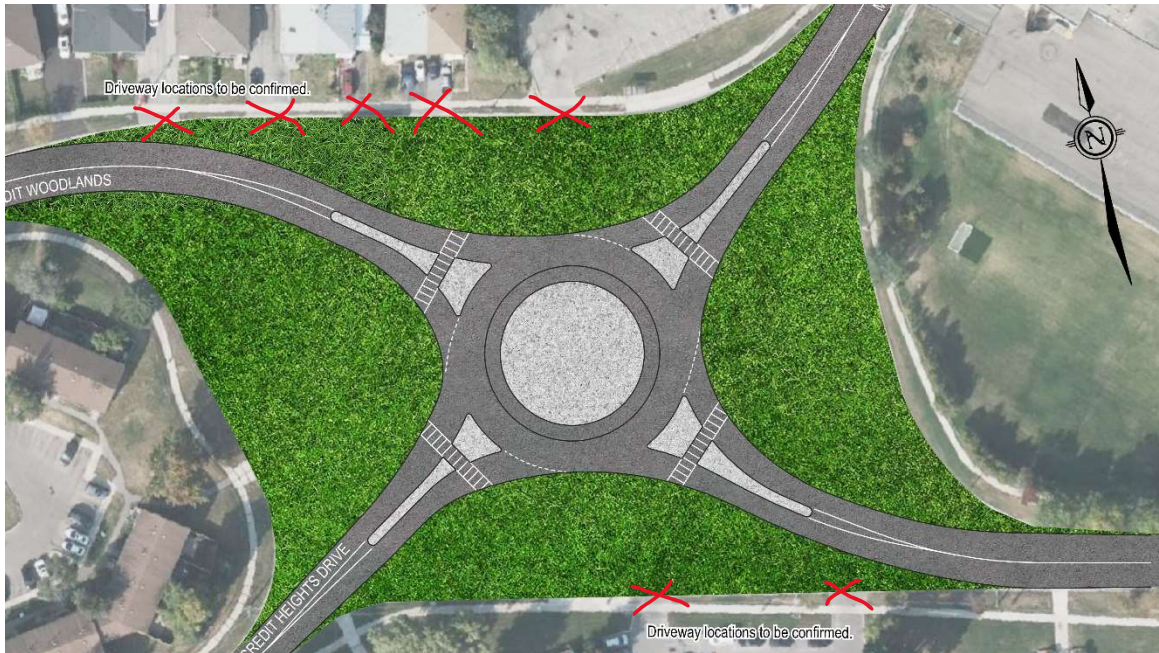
Concept sketch of central roundabout (potential property access impacts marked with an “X”)
